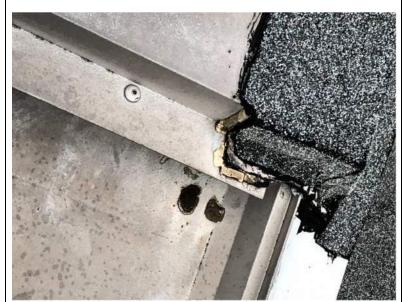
RIDGE SEAM MEMBRANE LAP.
